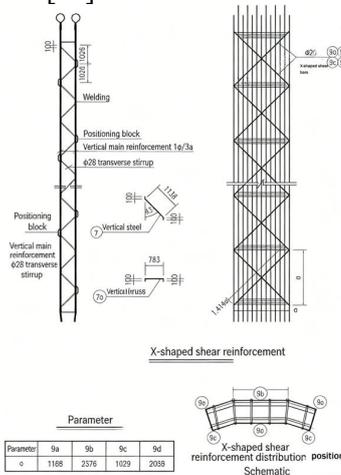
Detail Drawing of Reinforcement Cage Overall Strengthening Steel Bars
